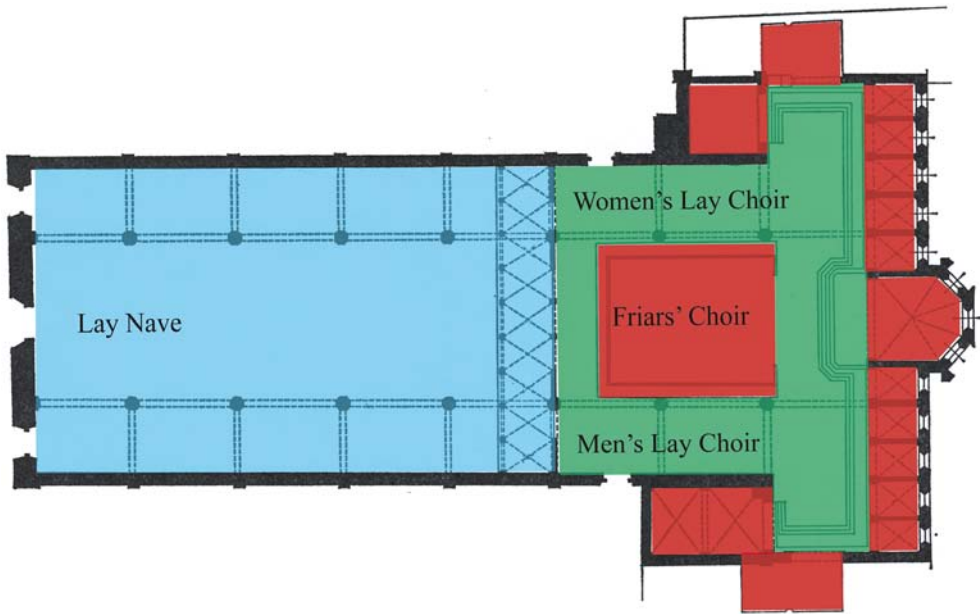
Santa Croce, Florence, Plan with Spatial Layers* (PLAN BY AUTHOR).
